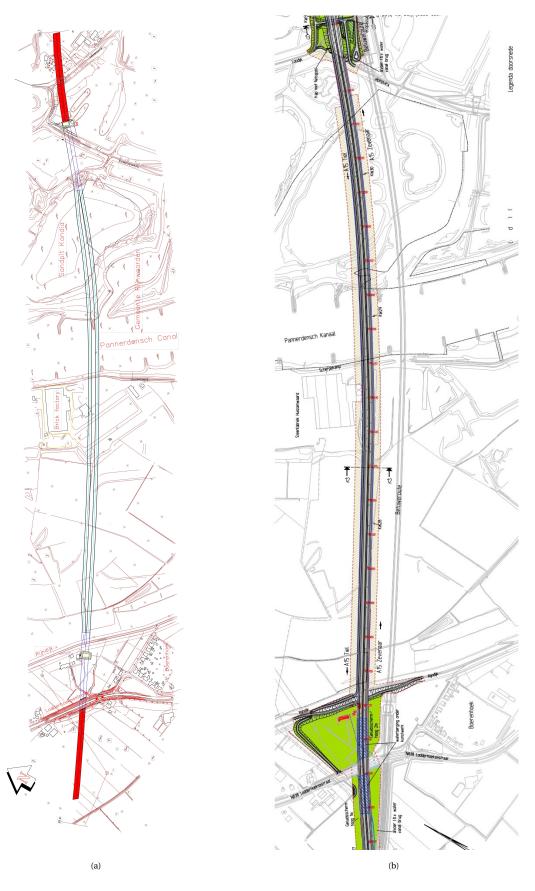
a) Horizontal alignment of double-tube bored tunnels b) Horizontal alignment of bridge
